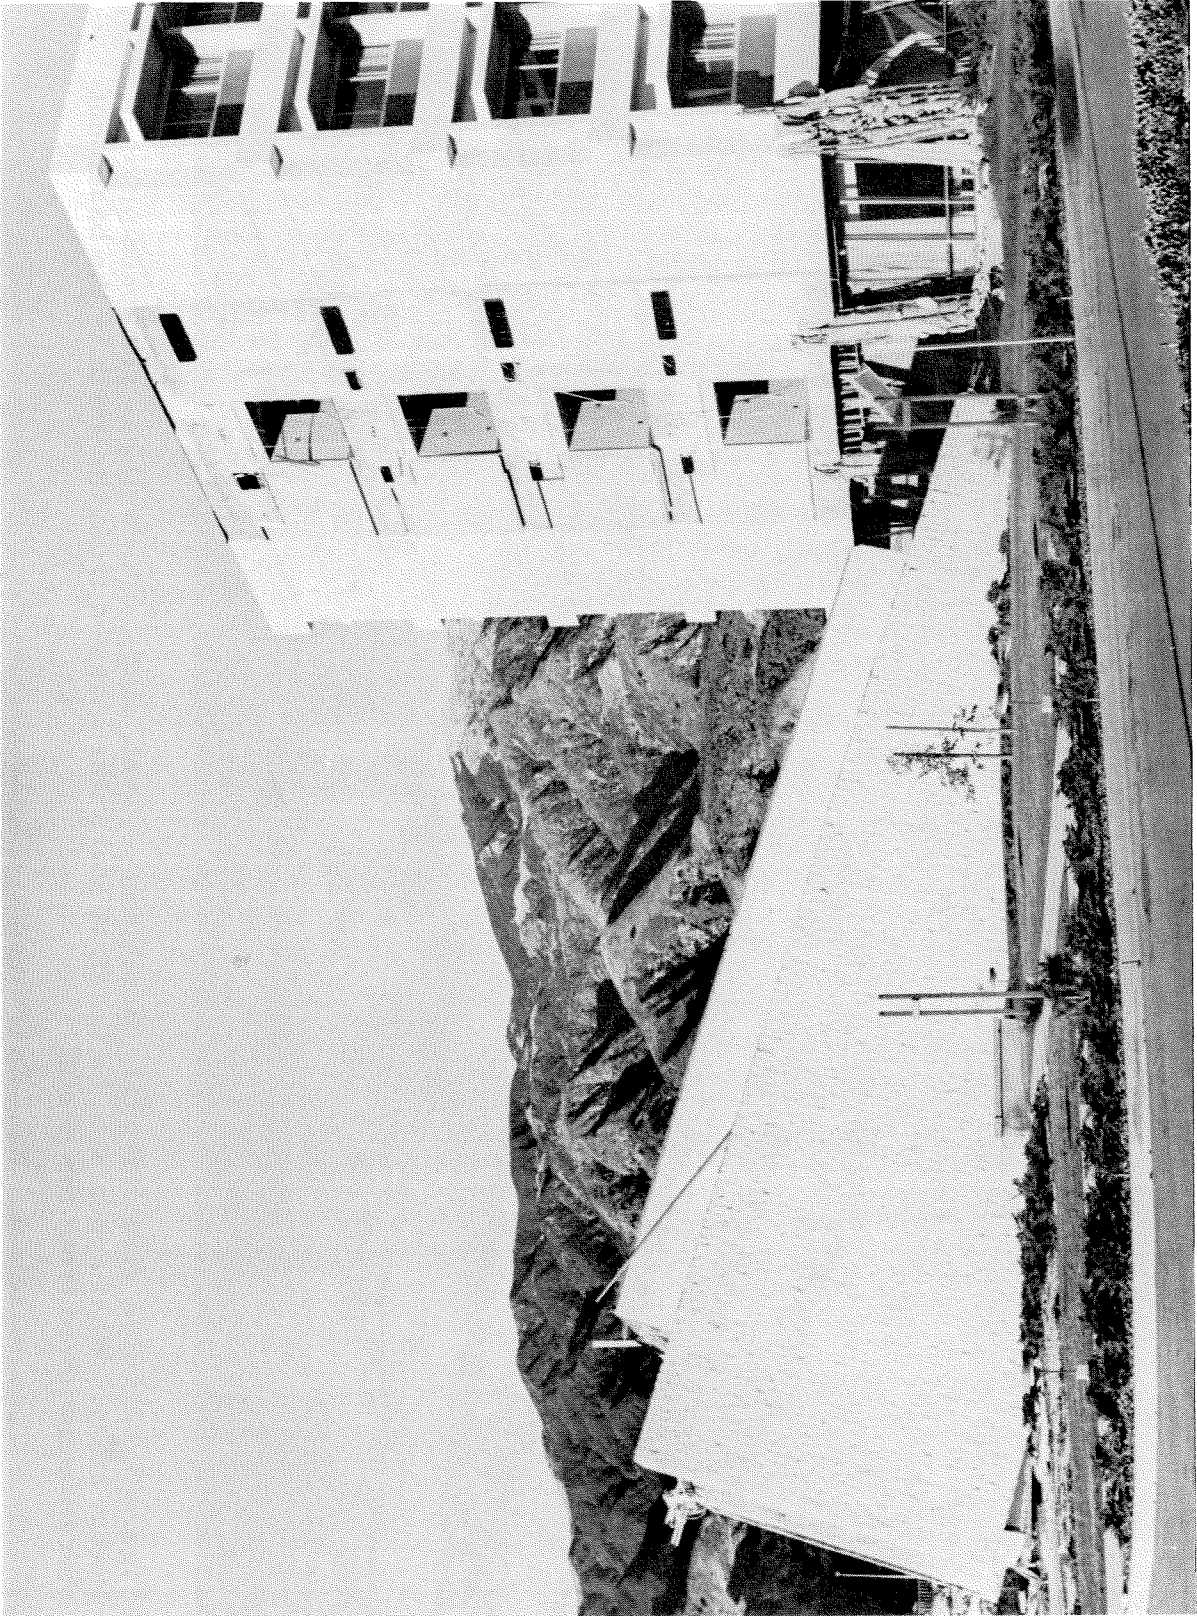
16 Collapsed stairwell at west end of Olive View Hospital building.
